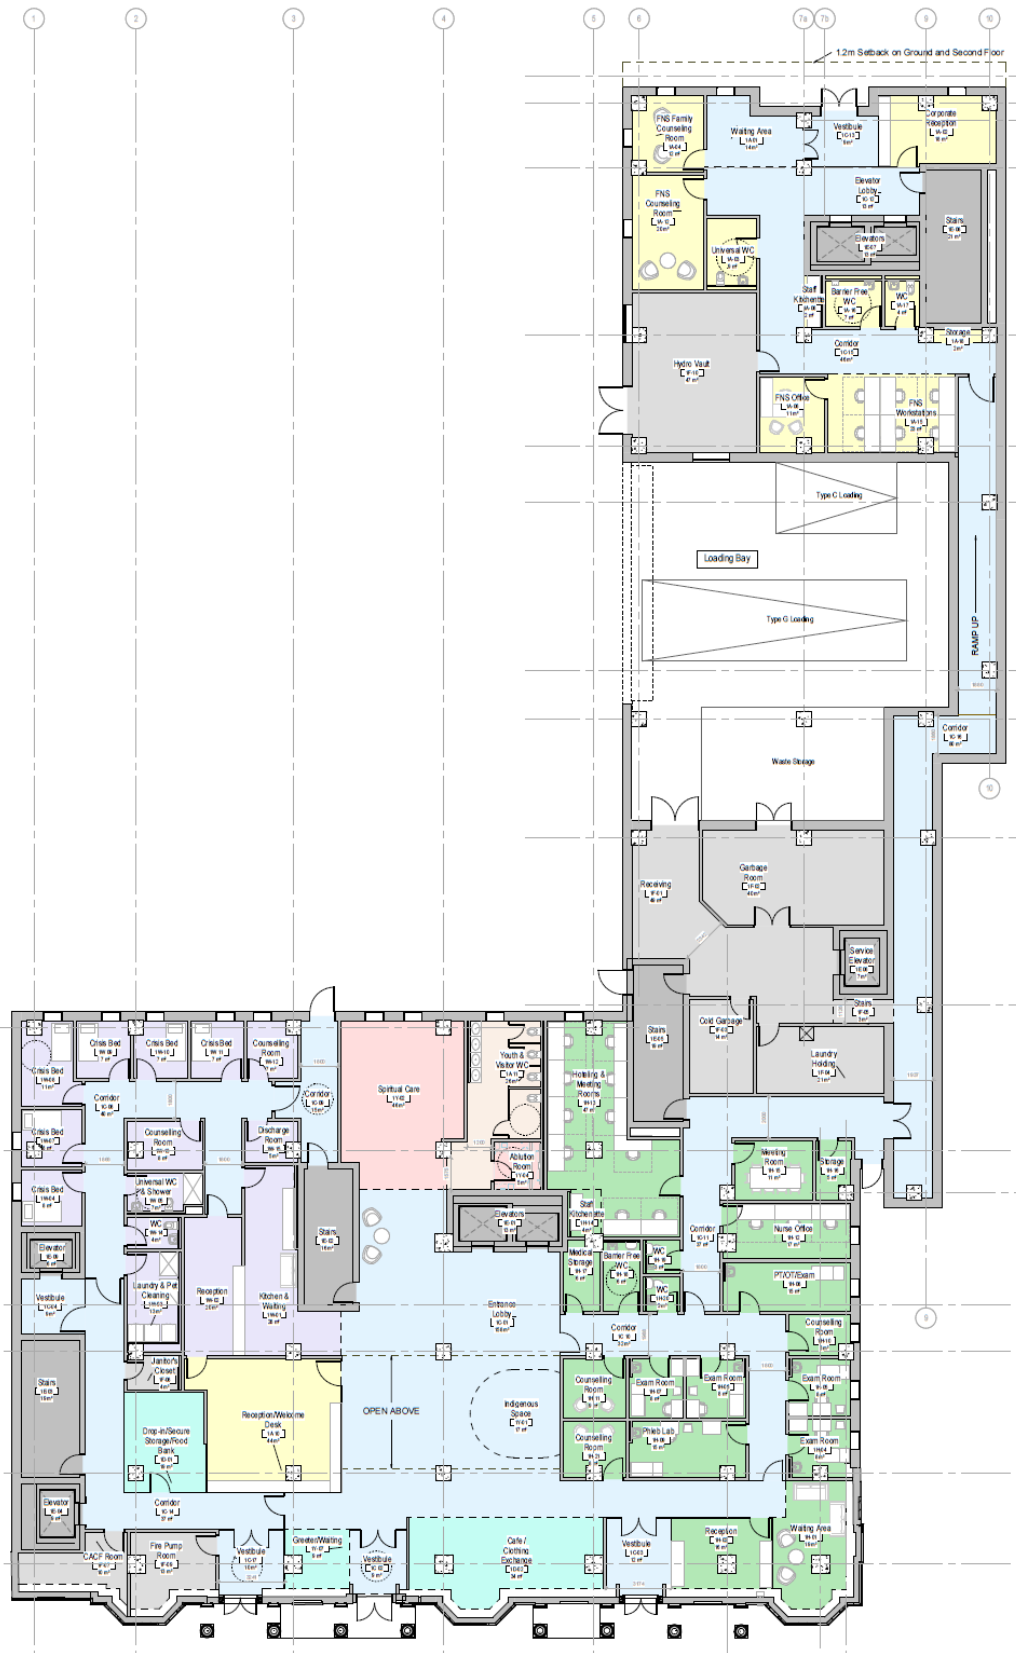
Ground floor for 20 Gerrard Street East included for illustration purposes (ERA Architects Inc. & Hilditch Architects Inc., March 3, 2026).
